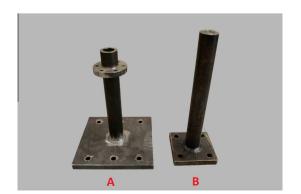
Tested specimens. Type A specimen with the larger plate (on the left) and type B specimen with the smaller plate (on the right).
